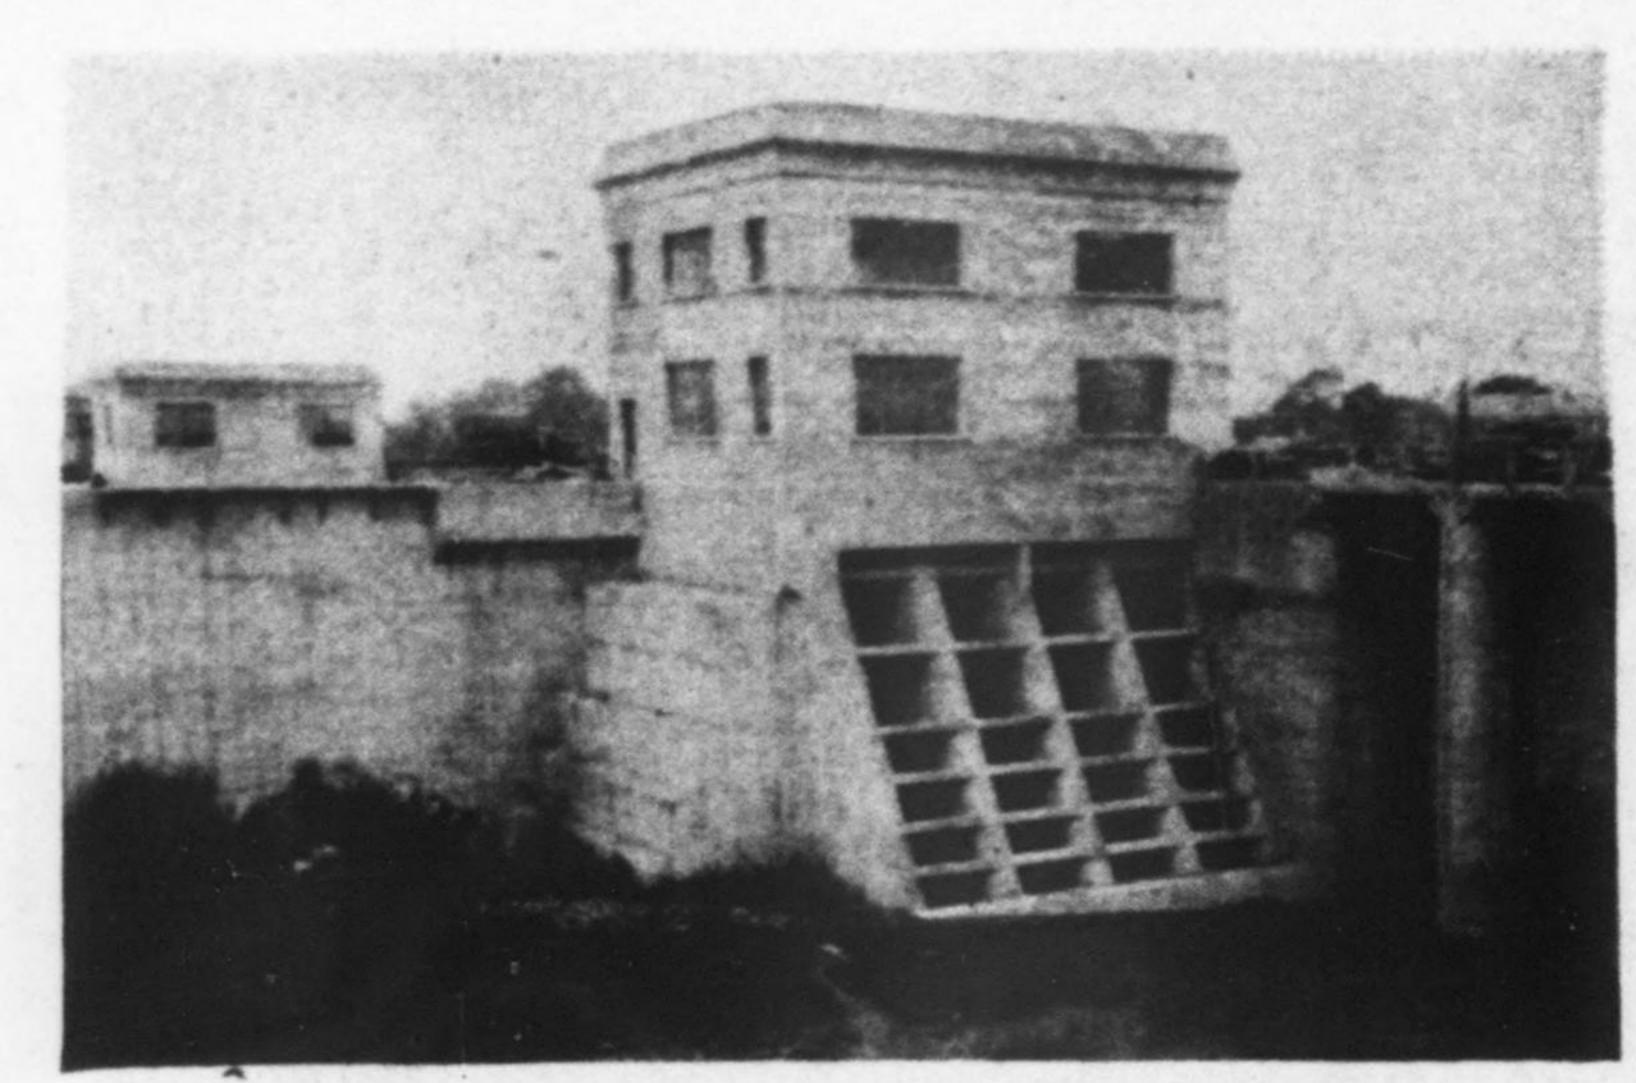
LOCK CONTROL TOWER AND SUPPLY INTAKE
